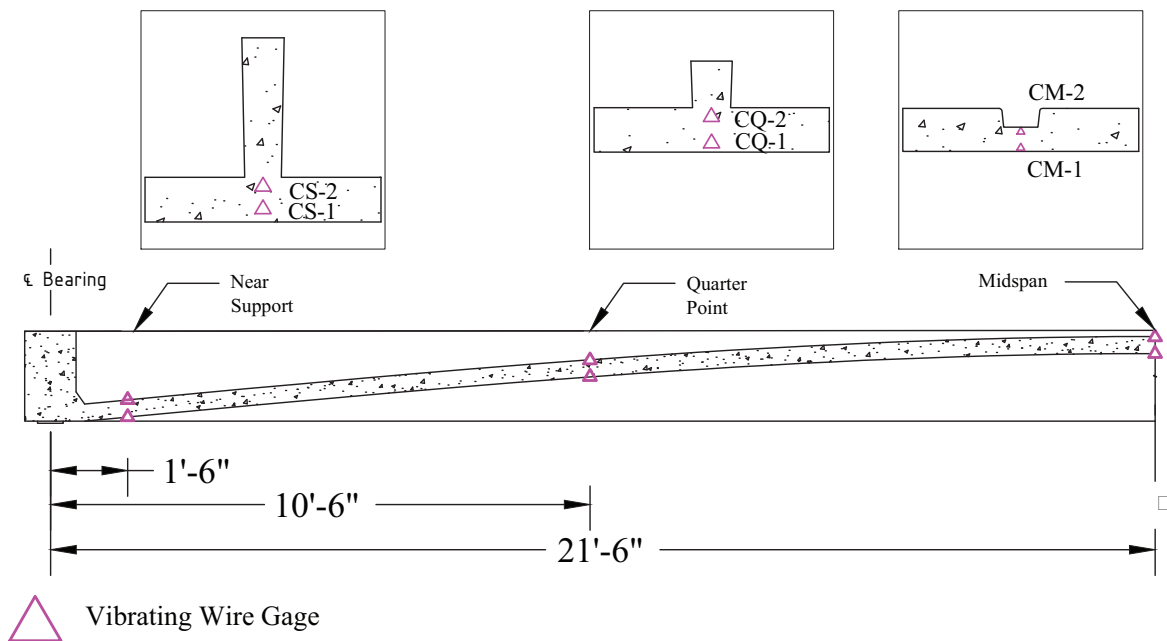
Elevation View of Concrete Arch Instrumentation
